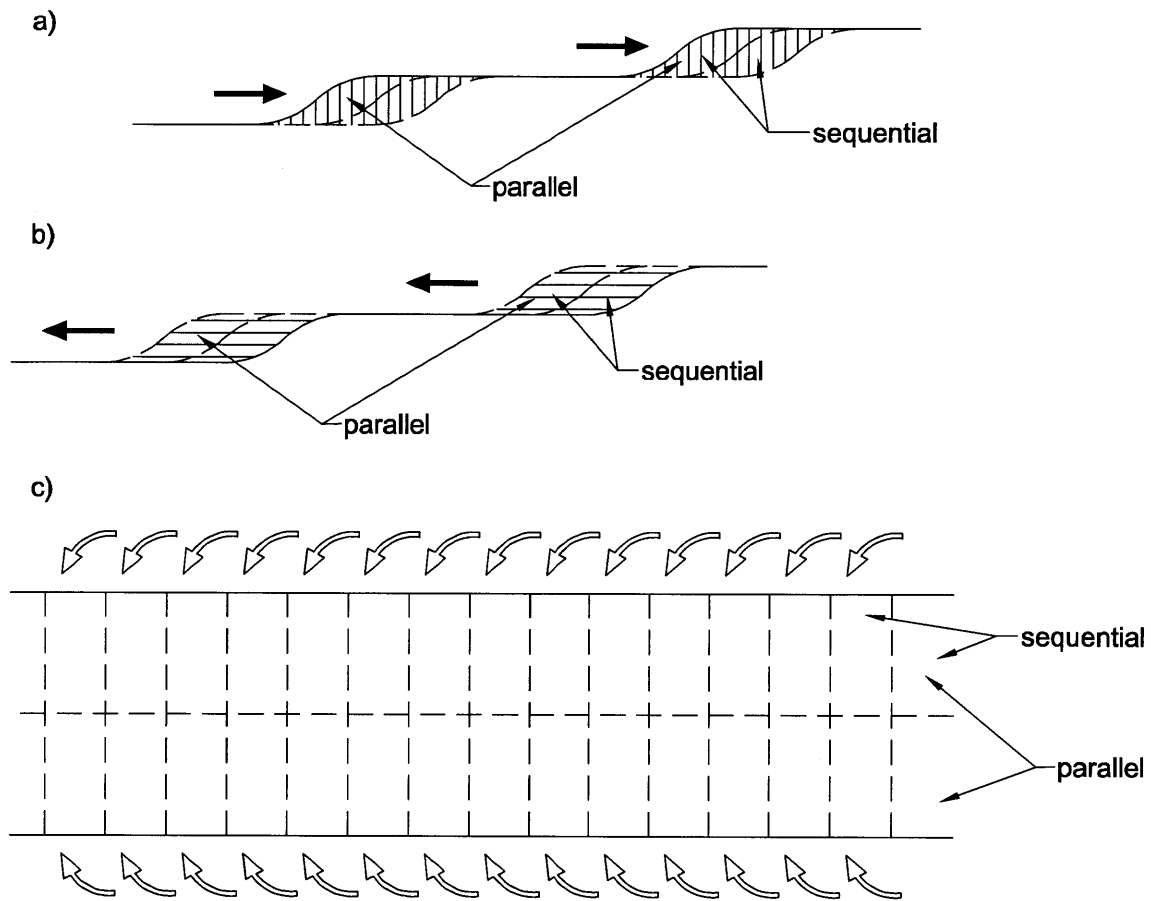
a) parallel and sequential excavation of a cut. b) parallel and sequential fill of an embankment. c) lateral parallel and sequential fill of an embankment. Cuts and embankments can be constructed in several ways, of which all include parallel and sequential processes.
